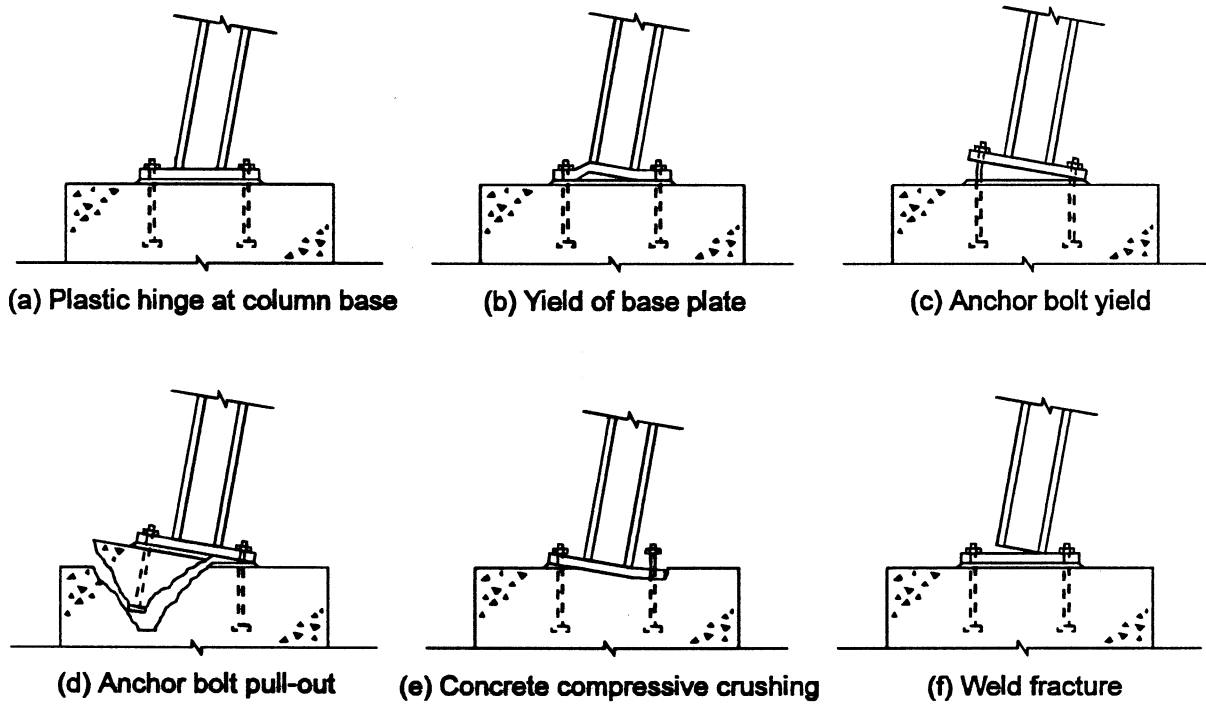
Various failure modes of columns with steel base plates attached to concrete with anchor bolts
